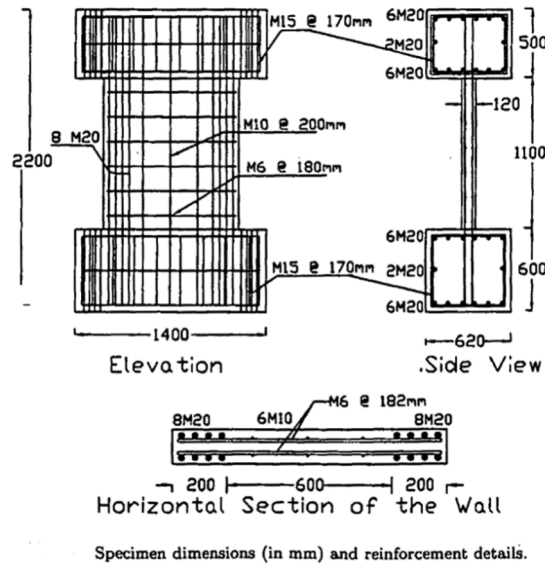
Reinforcement Steel Layout for Wall Specimens, Khalil & Ghobarah (2005).
